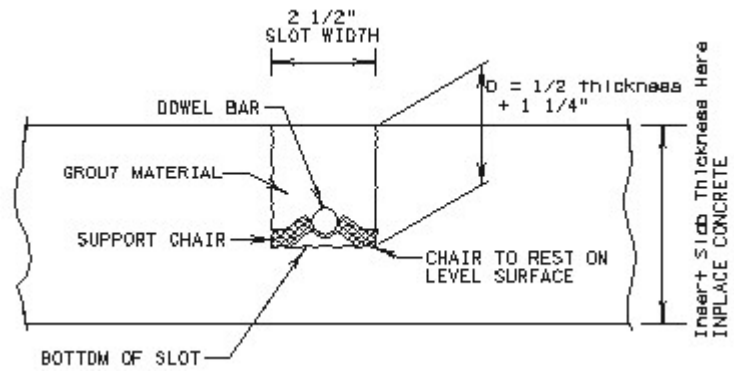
Typical End Elevation View of Retrofit Dowel Installation [3]
